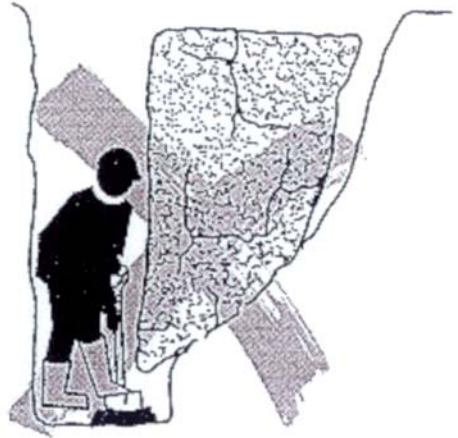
(b): Shear plane failure along the seepage (slippage) plane
